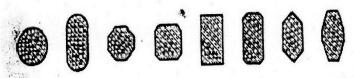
Typical cross-section shapes of piers for overcrossings or viaducts on land.
